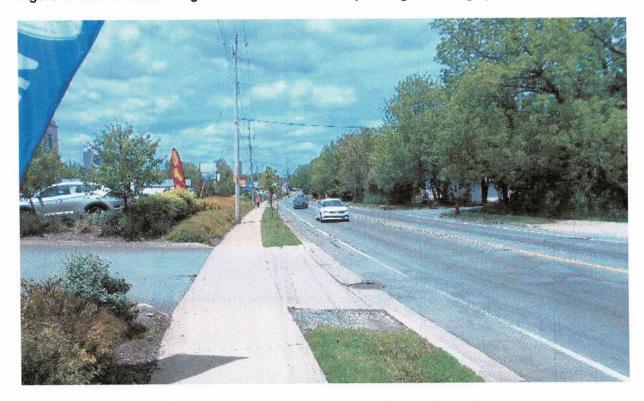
Site Access #1 Sight Line North of Access (Looking to the Left)
